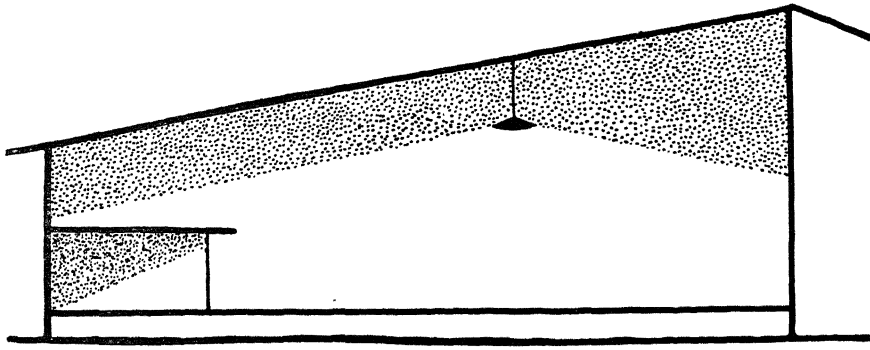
Lighting units with proper reflectors intensify the light on the floor and dropping boards. Place them 10 feet apart, 6 feet from the floor, and half way from the front of the dropping board to the front of the house.
